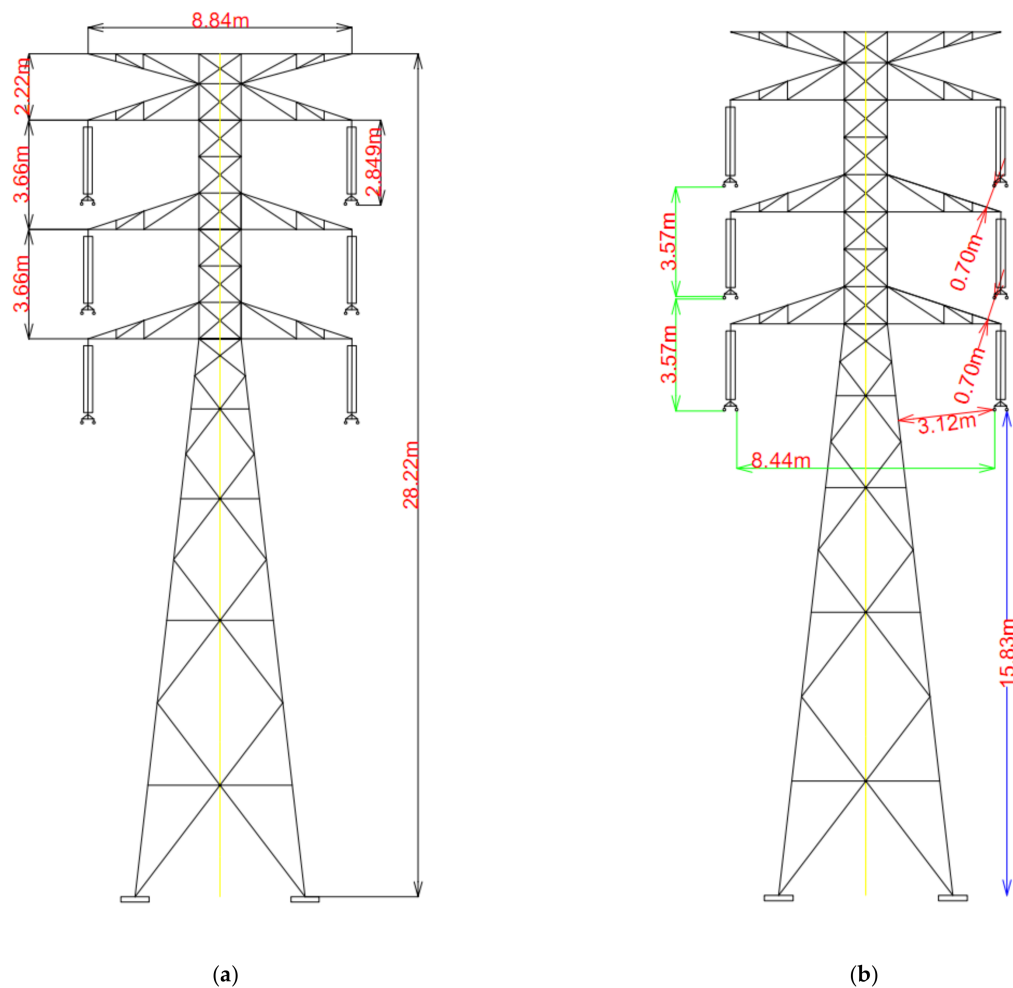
The 132 kV steel lattice tower (a) with 275 kV glass discs insulator and (b) electrical clearances under still air.
